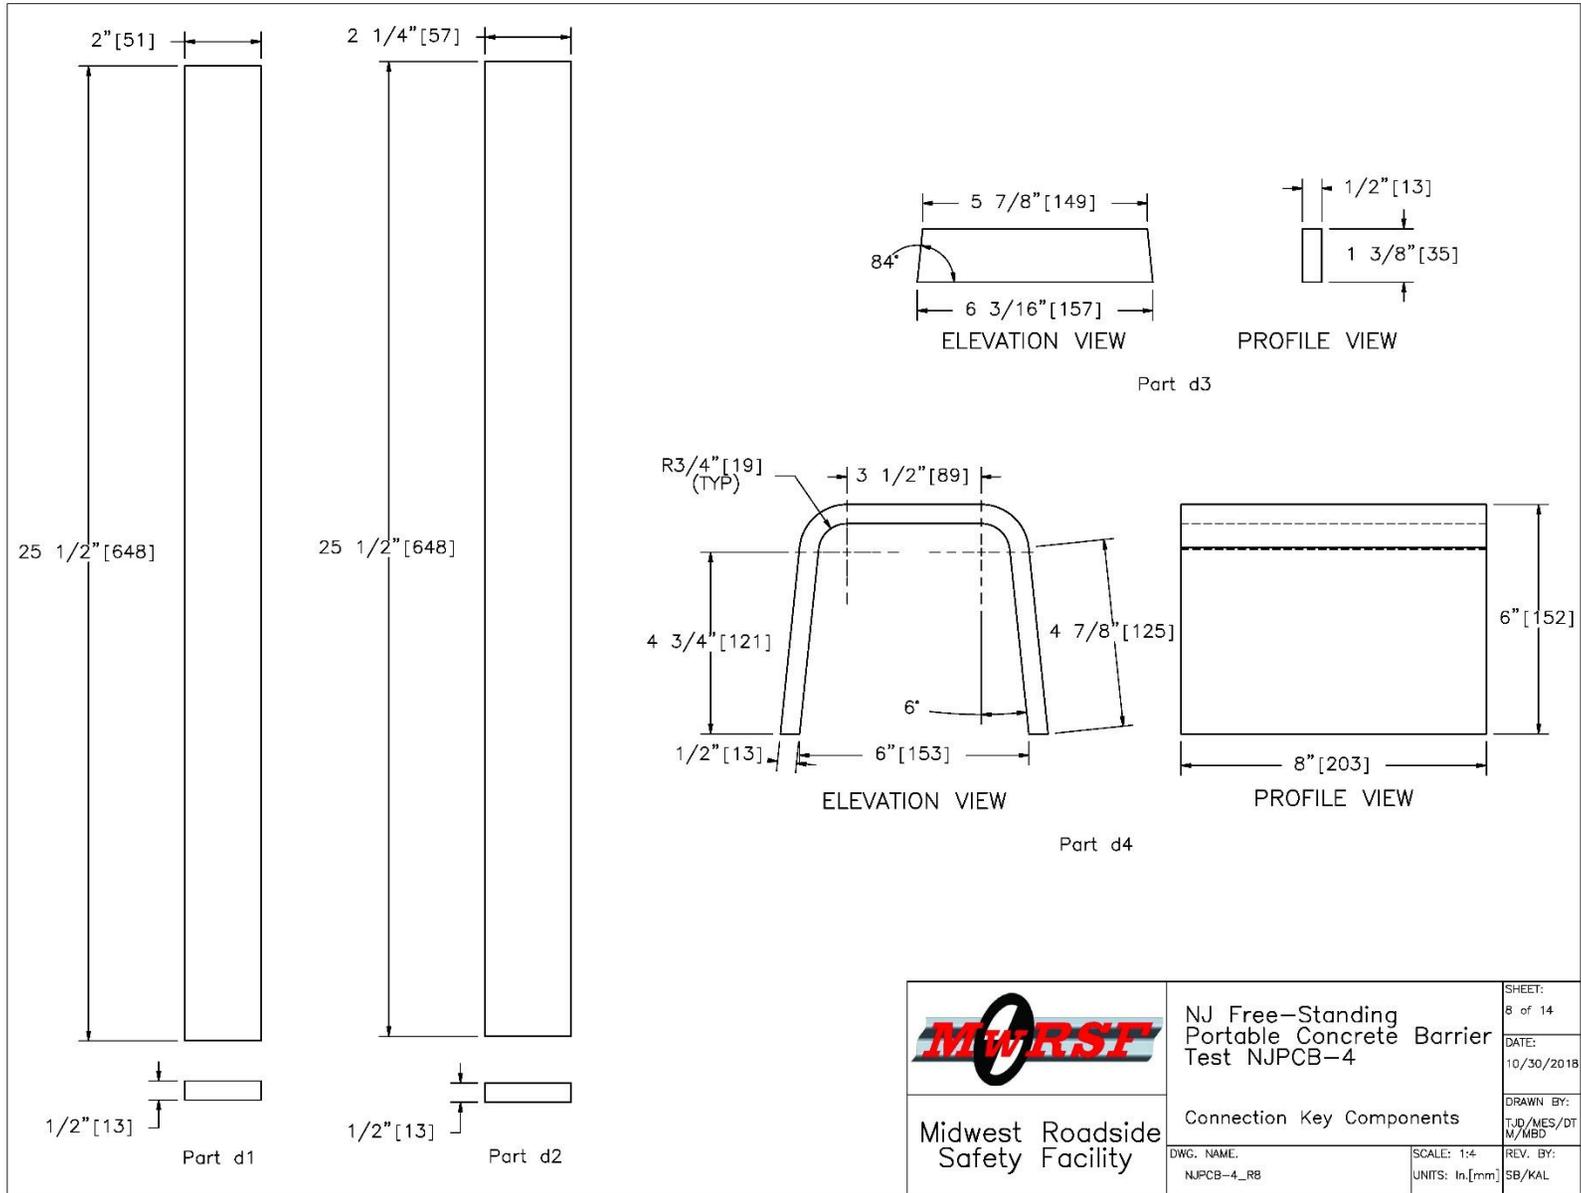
Connection Key Component Details, Test No. NJPCB-4
